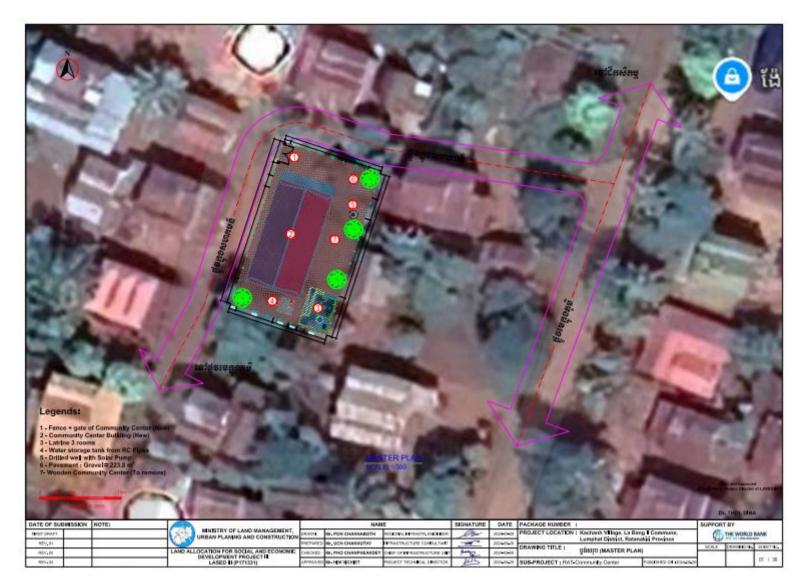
Master Plan for one new Community Center building construction under the LASED III Finance Support in Kachanh Village
